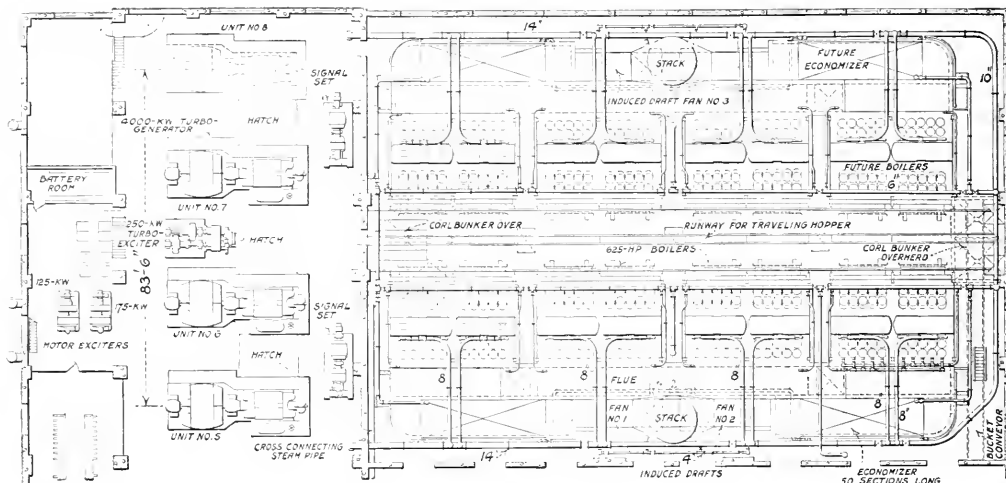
PLAN OF THE NEW SECTION OF THE PLANT
